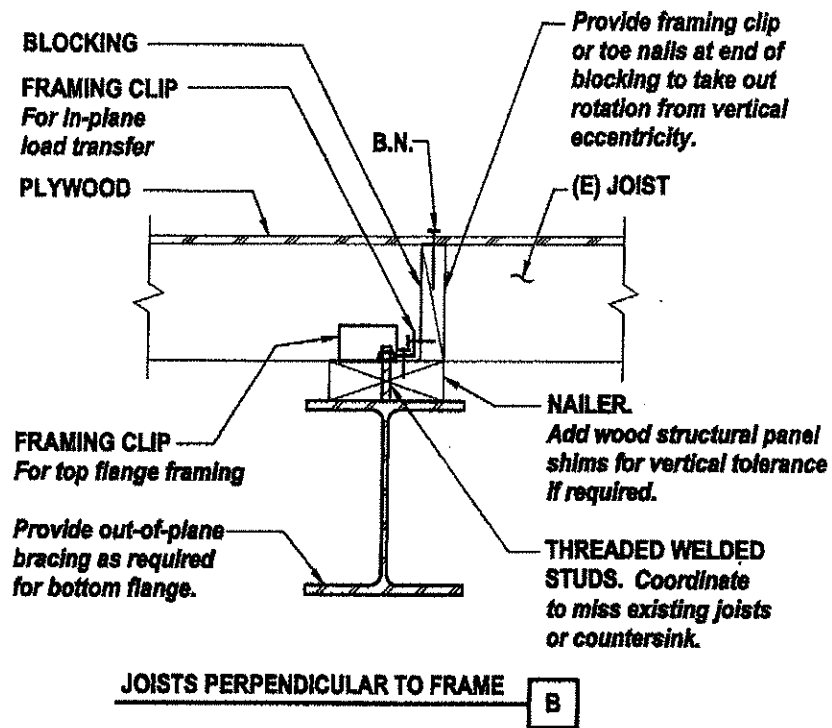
New Interior Steel Moment Frame to an Existing Wood Floor
